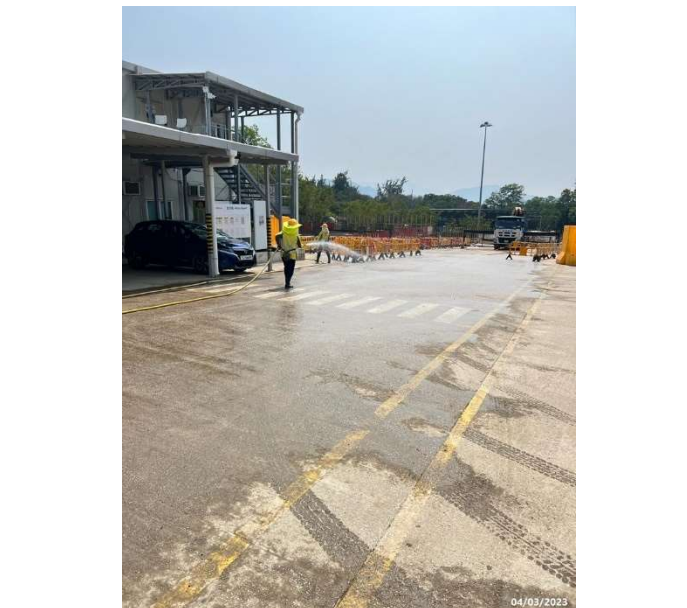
Water spraying by water tanker along the haul road between Portion A and the SBA
